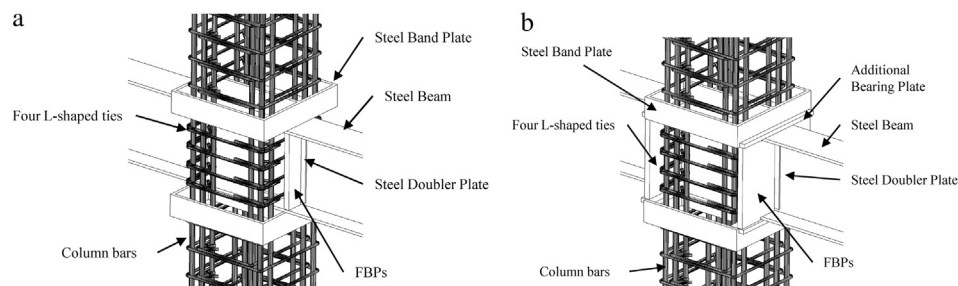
Details of specimens 1 & 2. (a) Specimen 1. (b) Specimen 2.
